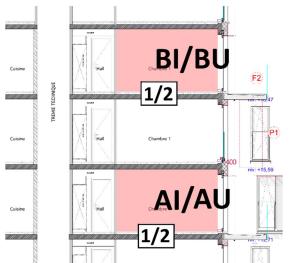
Section in units AI/AU and BI/BU with wall numbering
